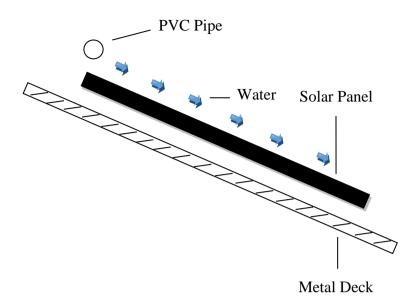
Cross Section View of PVC Pipe Drip onto the Solar Panel
